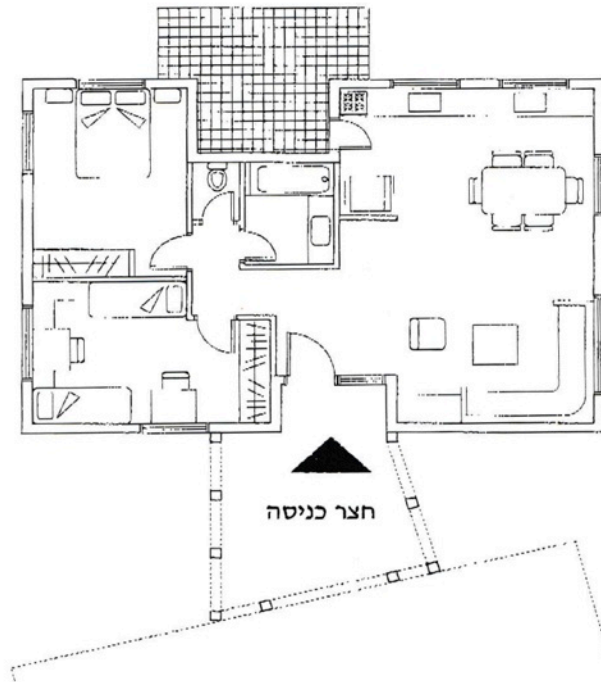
Rachel Waldan, plan drawing for low-budget units in Pnei Kedem, 2002. A pious architect, Waldan planned the units with double sinks required for a kosher kitchen, and allowed a clear separation between the private and the public functions of the house. But for the residents of Pnei Kedem it was not enough. Source: Pnei Kedem Archive.
